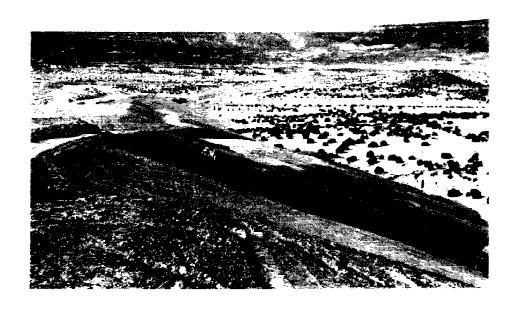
Dozers finishing final slope on North Jackpile dump JP-WS-19C (looking NE).
